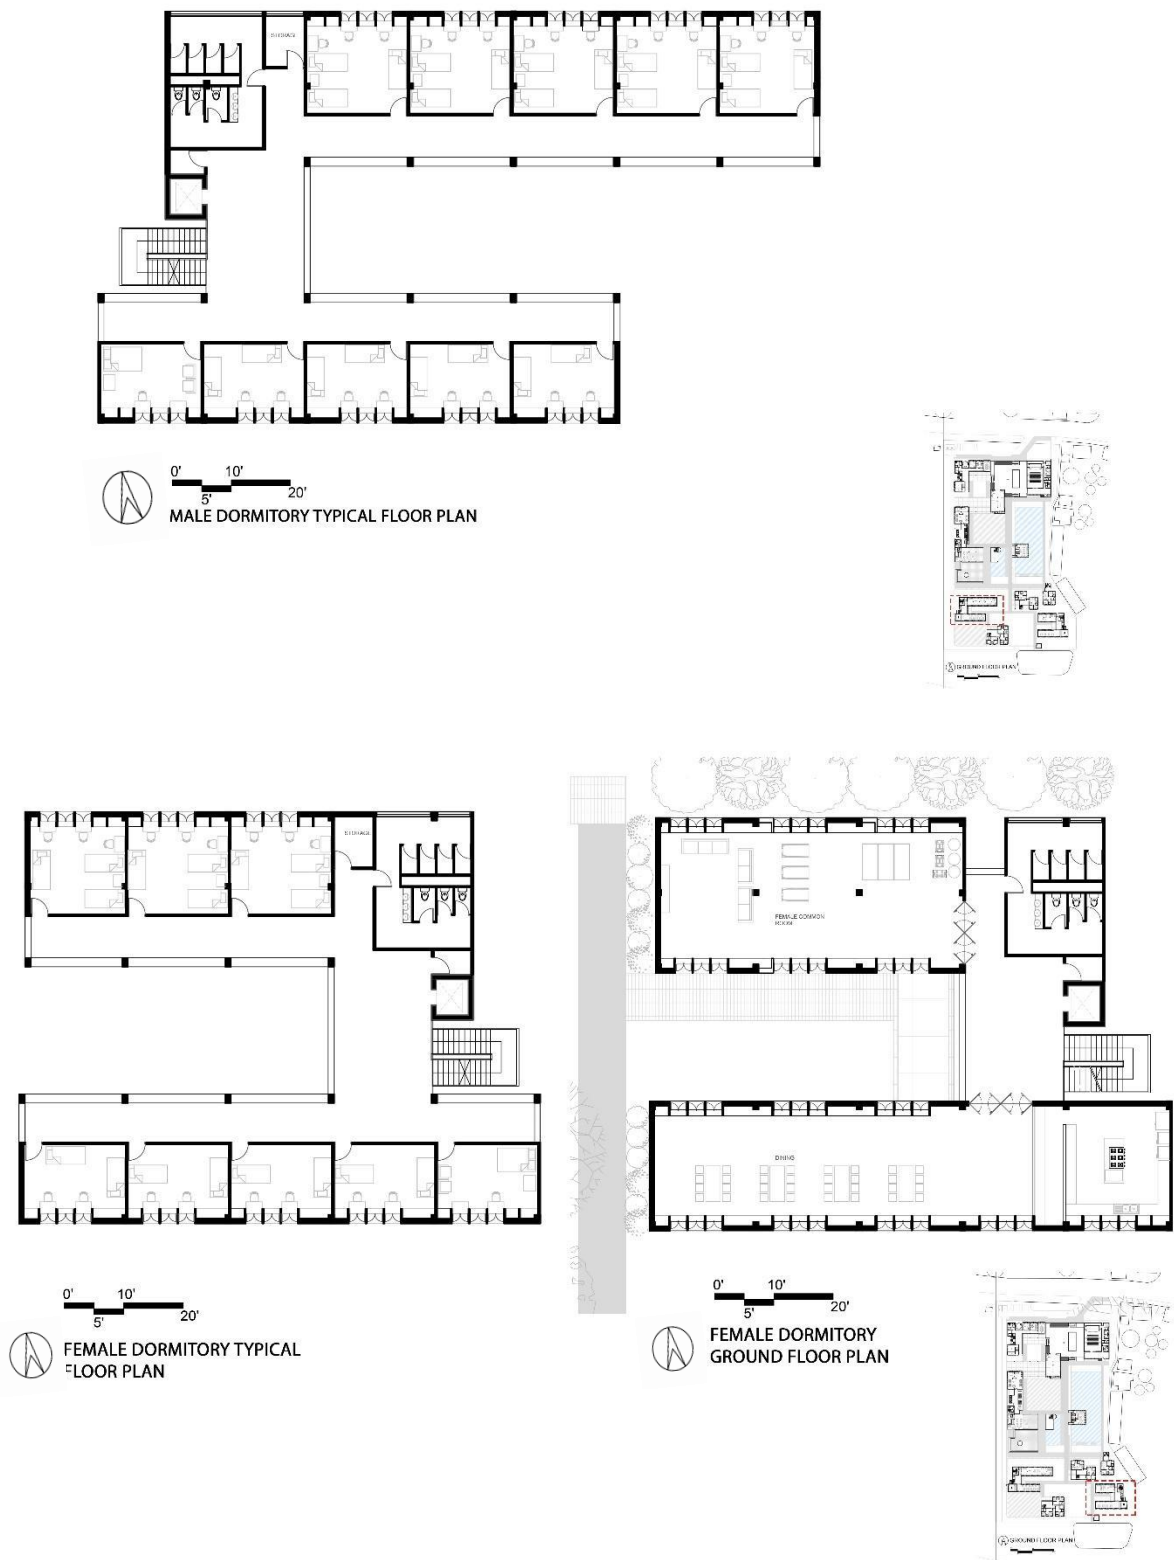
Dormitory floor plan blow ups (Source: Author)
